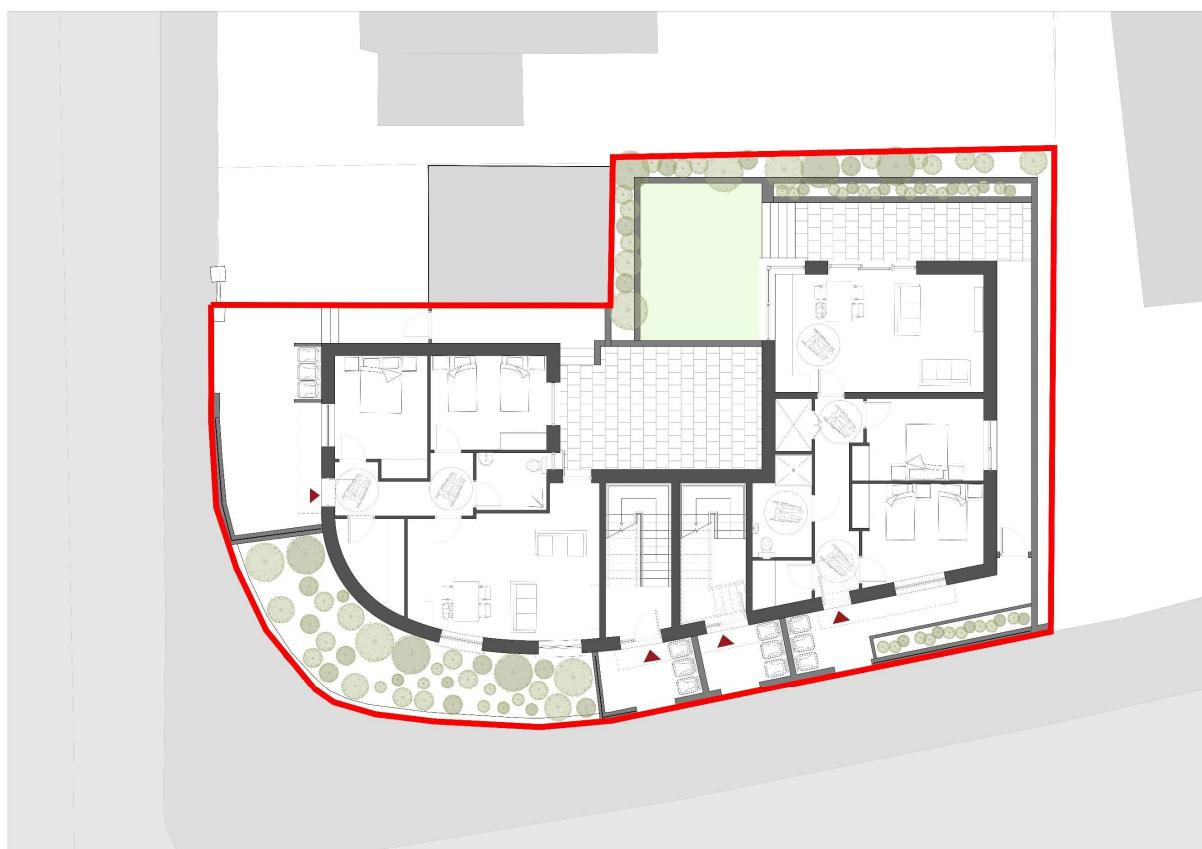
Proposed Site Layout by author showing the proposed dwellings & their relationship to the corner site.
